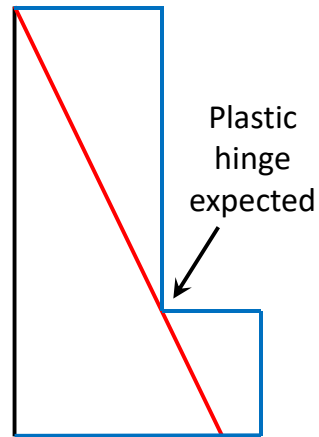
Column moment demand and moment capacity when bars are cutoff at  $\frac{1}{4}$  location of the column height, Bridge 1
